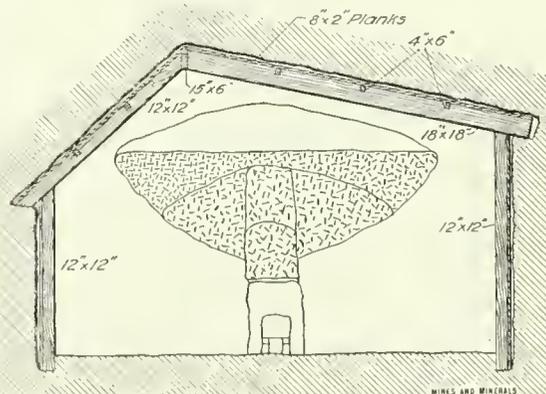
METHOD OF EXCAVATING PUMP ROOM
